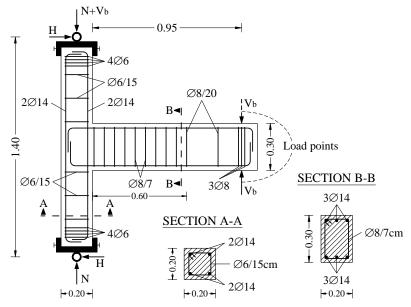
Dimensions and cross-sectional details of original subassemblages O₃, W₂, M₁, M₂, M₃, M₄ and M₅
